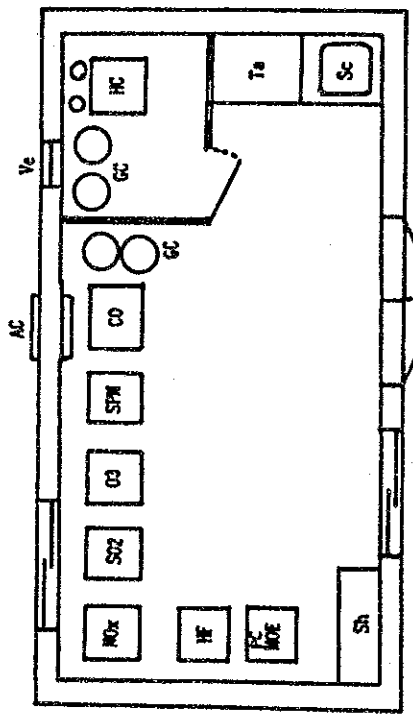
LAYOUT PLAN FOR INSPECTION STATION
